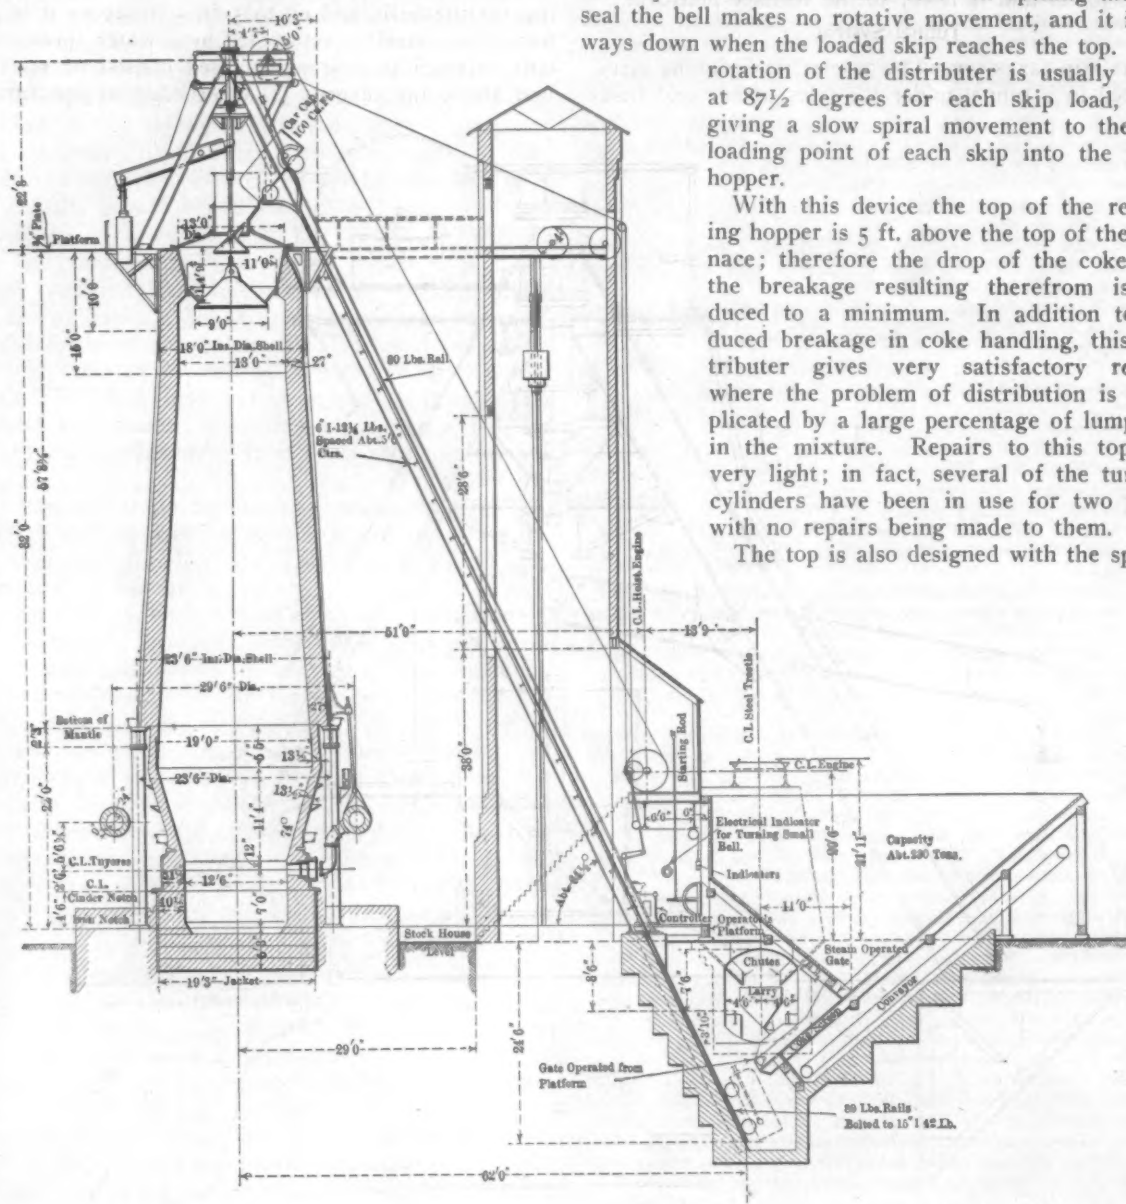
Section Through New Earlston Furnace, Showing Arrangement of Hoist House, Tunnel for Ore Larry and Coke Screening Device.
